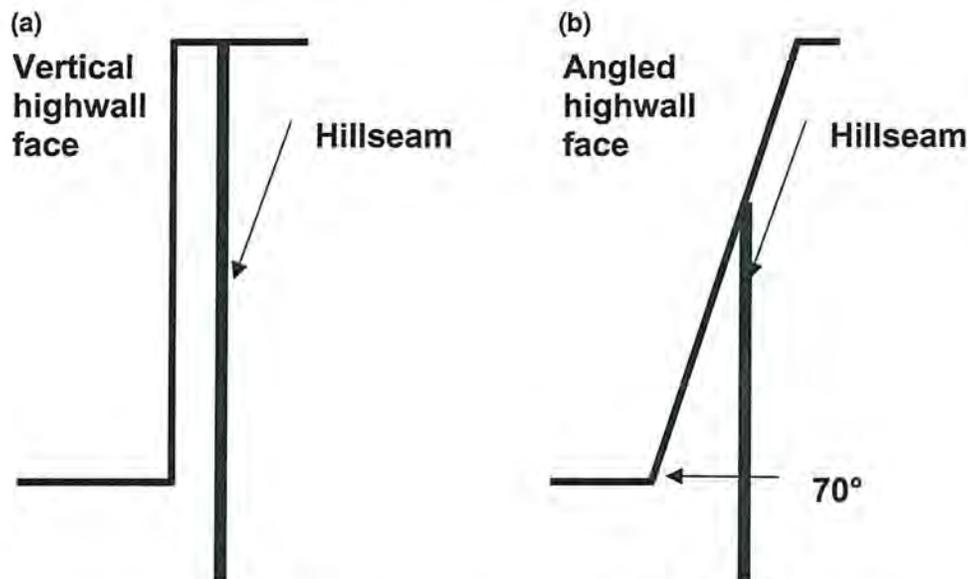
Vertical highwall containing hillseam (a) and 70° highwall with hillseam (b).
